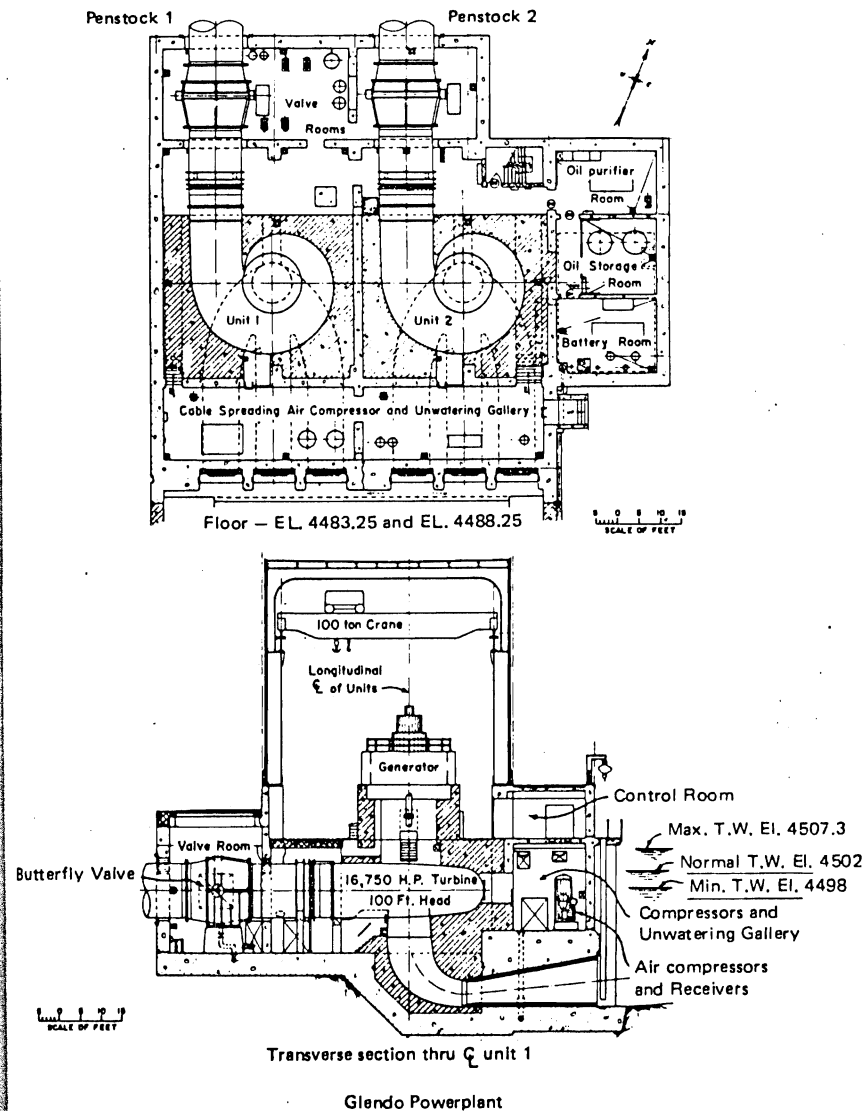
Plan layout and cross-section of conventional powerhouse. SOURCE: U.S. Bureau of Reclamation.
